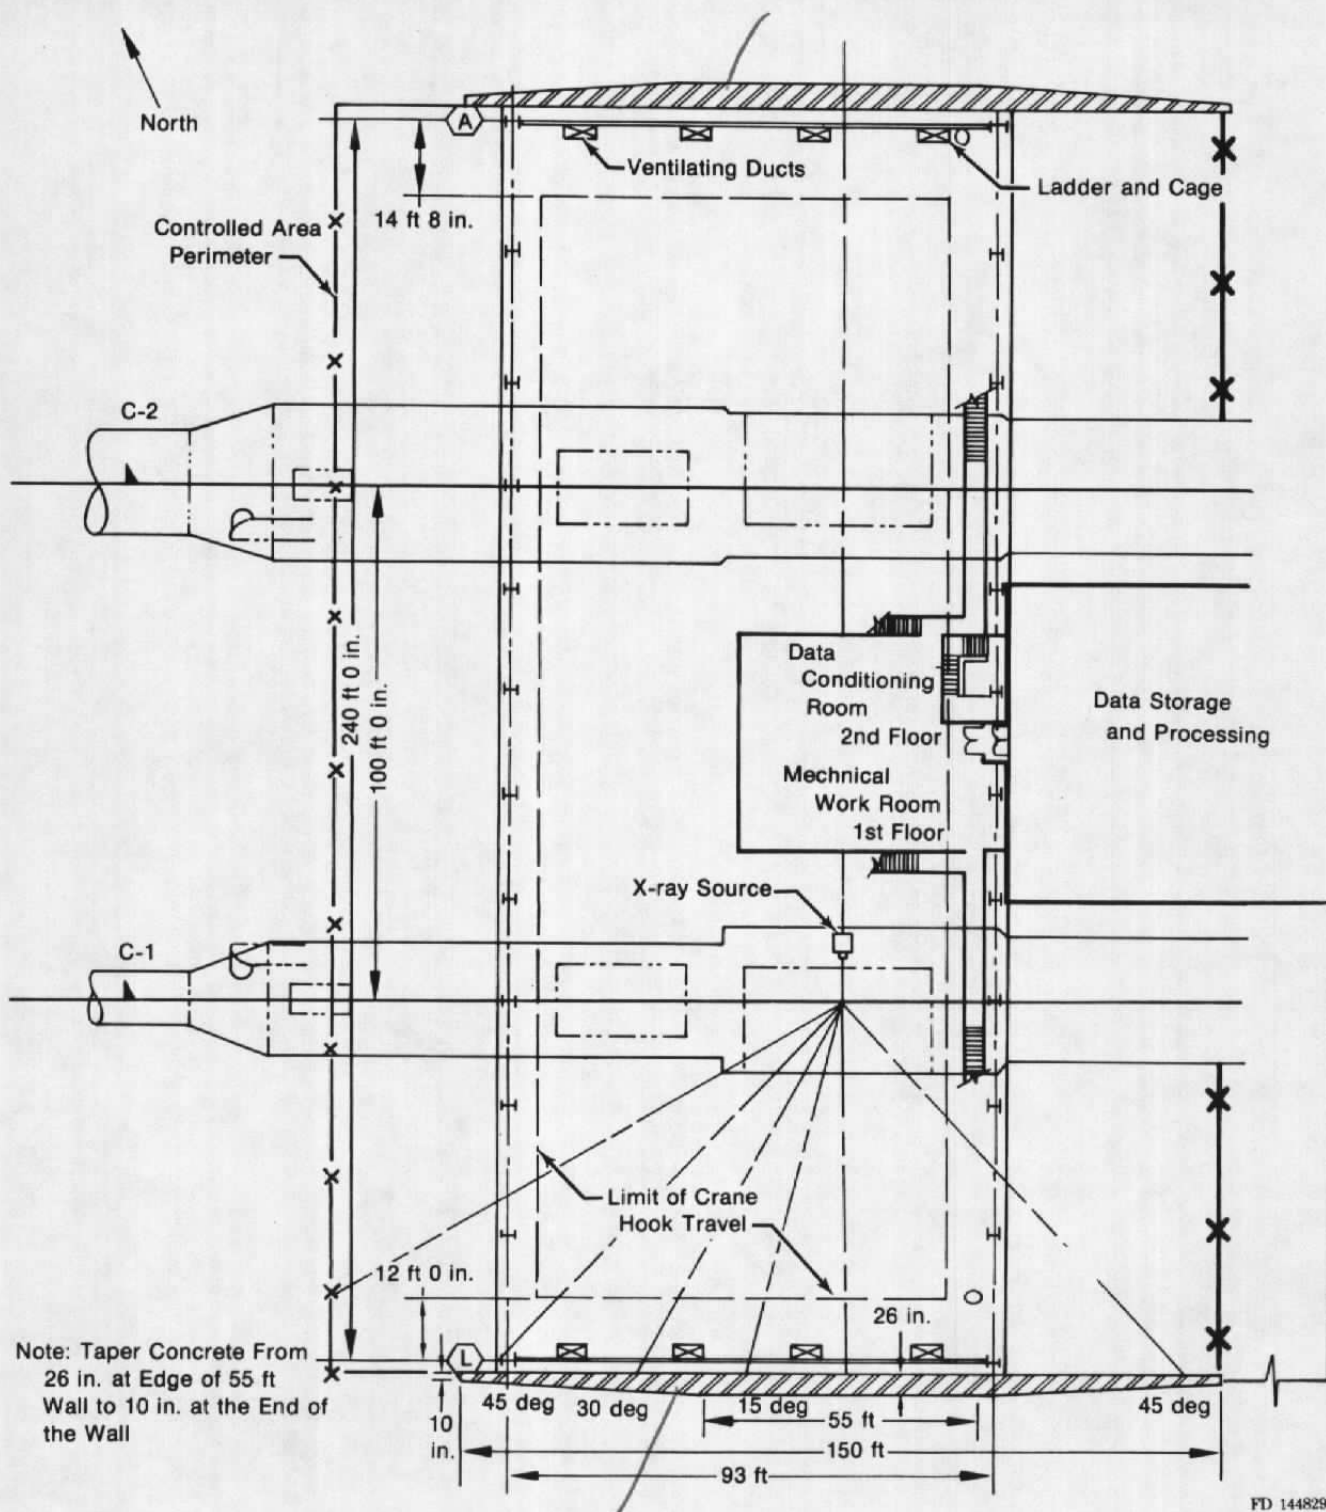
Plan of Facility With Concrete Barrier and Perimeter for Test Cells C-1/C-2
